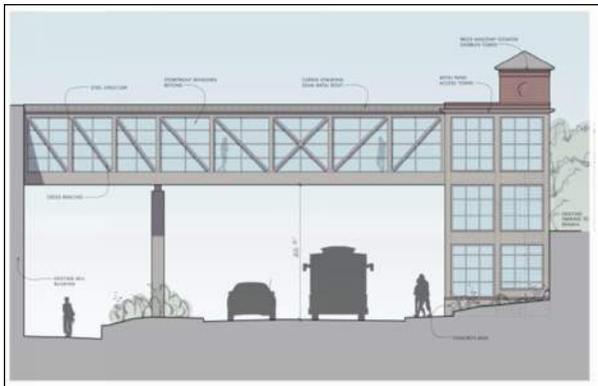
Sky Bridge Elevation, Alternative 4a (DeStefano Architects, 2013)
